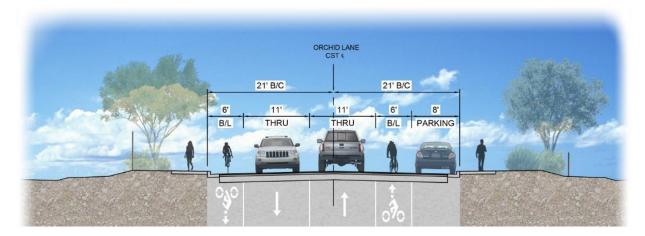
Orchid Lane Typical Section - Segment H3 Standard Bike Lanes/South Side Parking A
